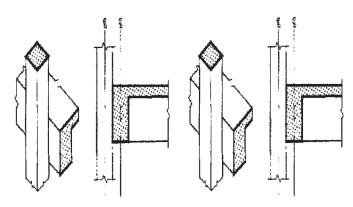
Eccentric Load Paths Created by Architectural Detailing of Structural Connection
